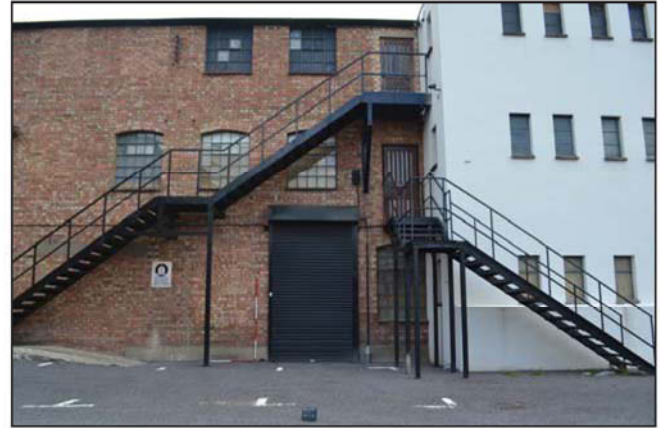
Exterior, original building, front elevation, centre, looking southeast, Scales: 2m and 1m.
